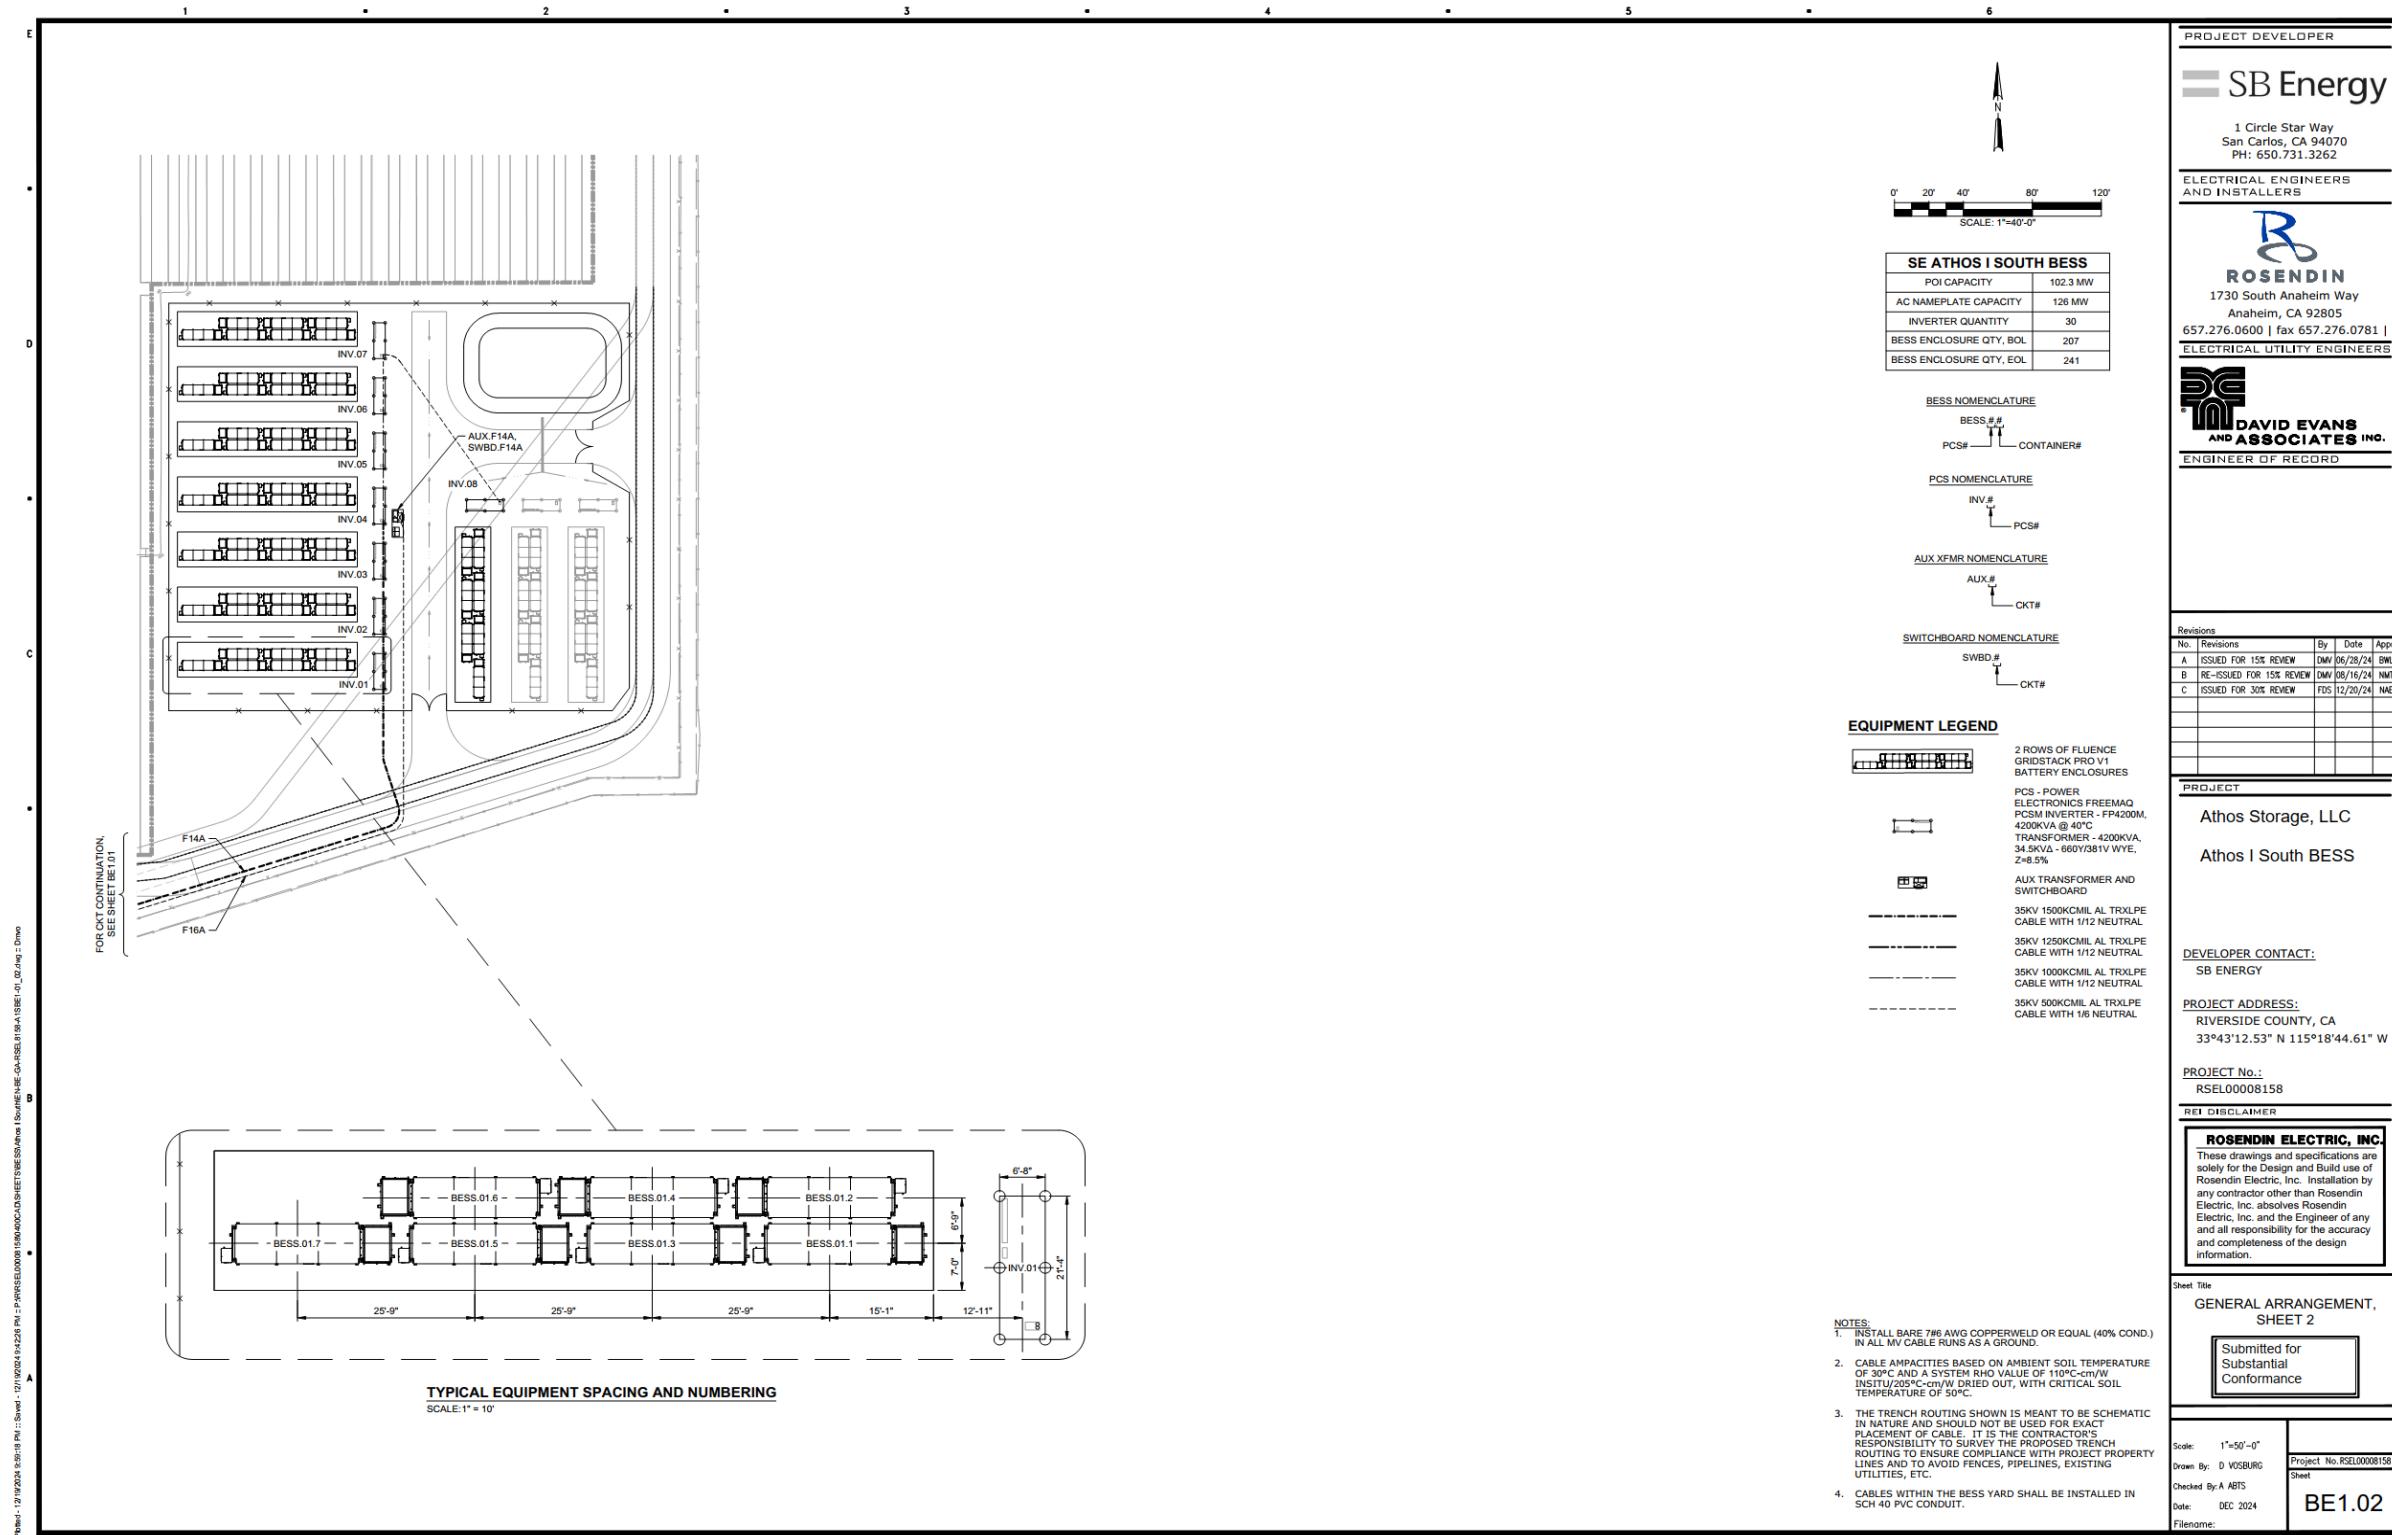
Preliminary Site Layout - BESS Site 3, Section 2
